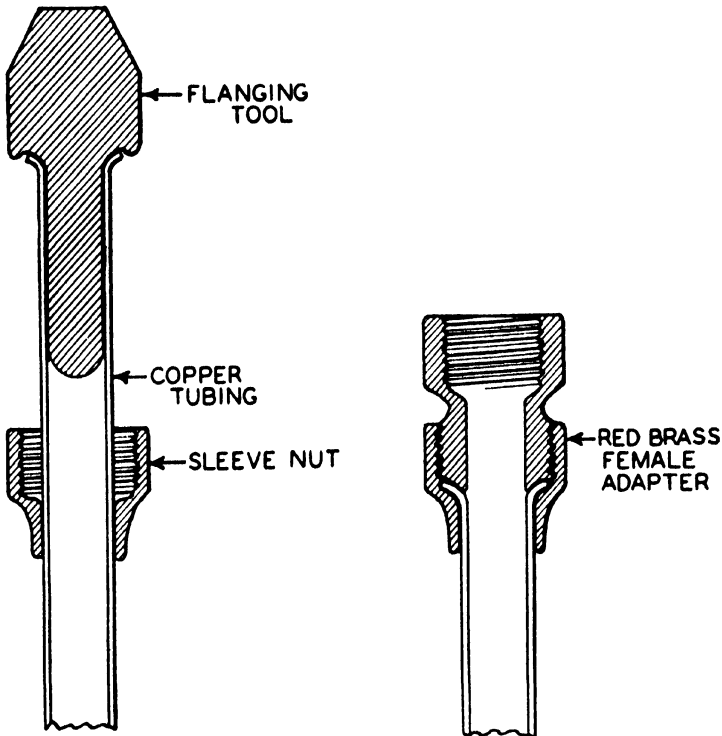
Cross-section of copper tubing with flanging tool and sleeve nut in place.
